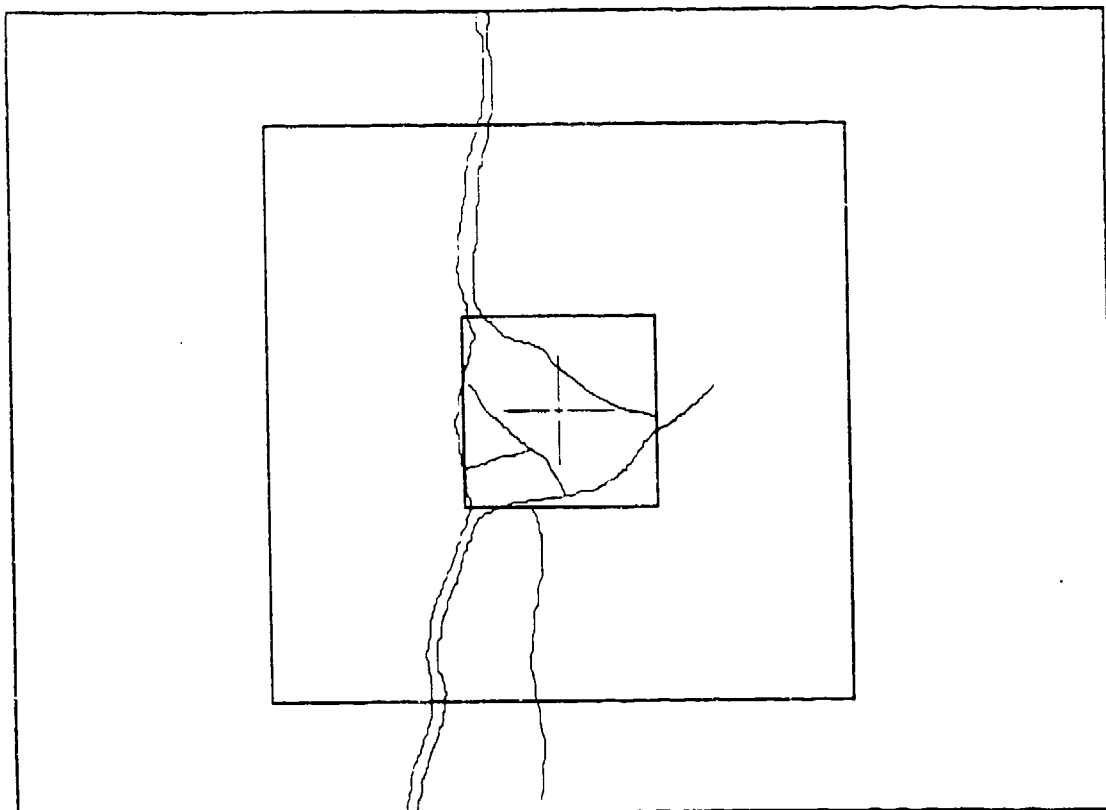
A Schematic of Test 20 Wall Damage (Type C, 2.8-Pound Equivalent Charge).
